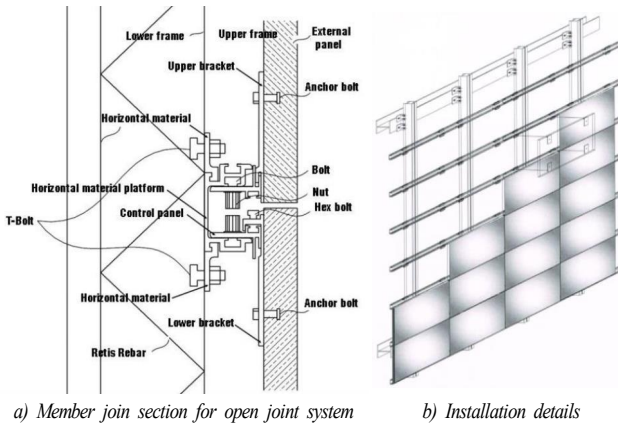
Open Joint Curtain Wall Exterior Insulation System Installation Drawings
